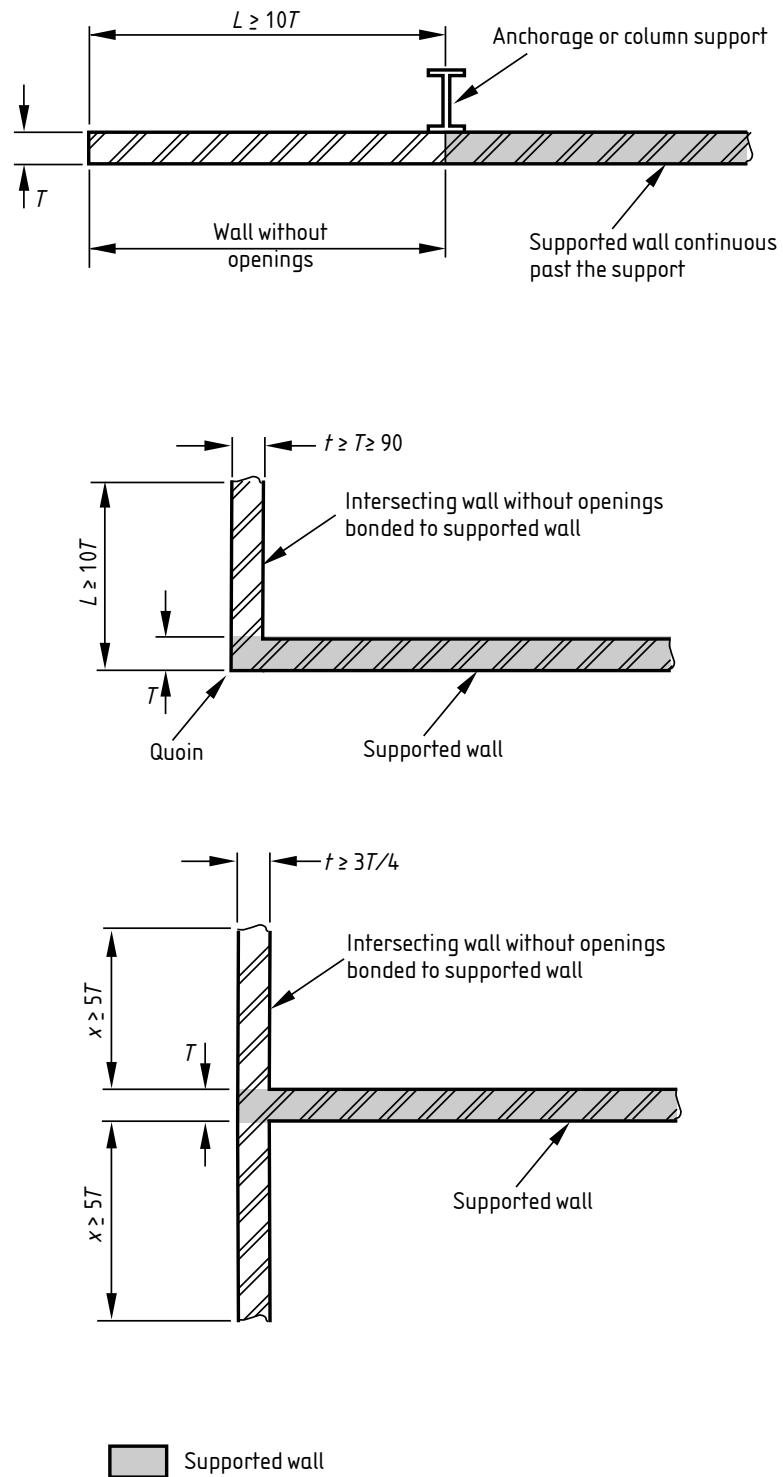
Fixed support assumed in a single-leaf, collar joint or grouted-cavity wall
